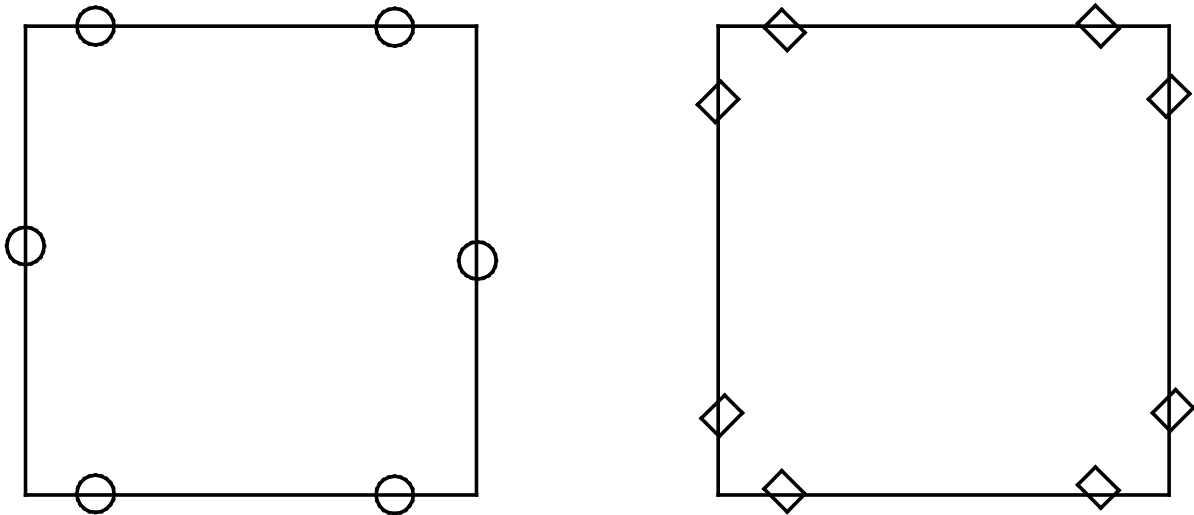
Glazing frame attachment techniques (rivets/screws)
